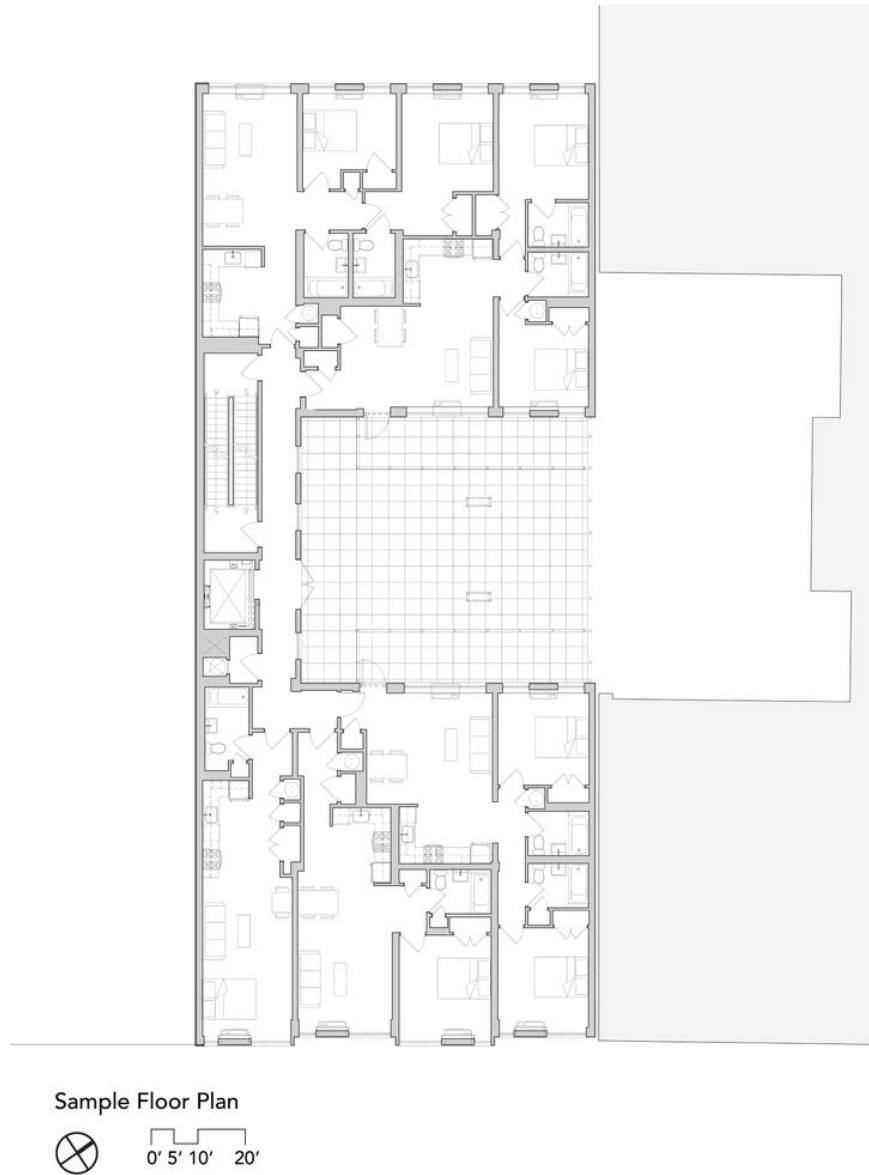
Sample floor plan showing how a typical story is laid out and used among residents. Credit: GLUCK+
